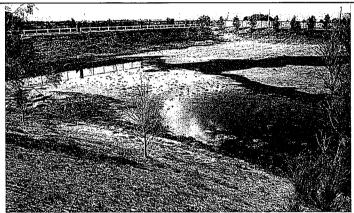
Looking northeast-extent of sediment basin with ponded water from runoff.
